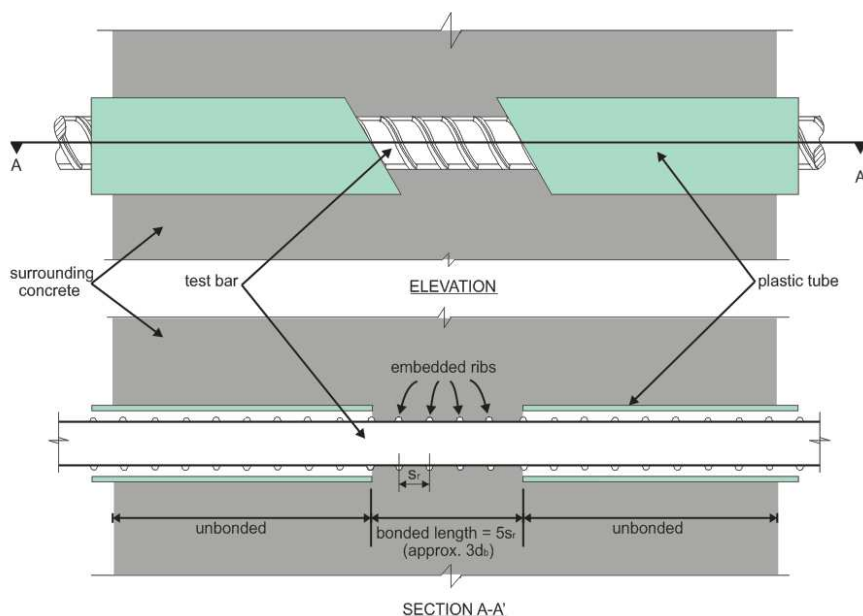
Schematic diagram showing the elevation and cross section of the bonded length achieved by embedding a short length of deformed reinforcing bar within the surrounding concrete block.
